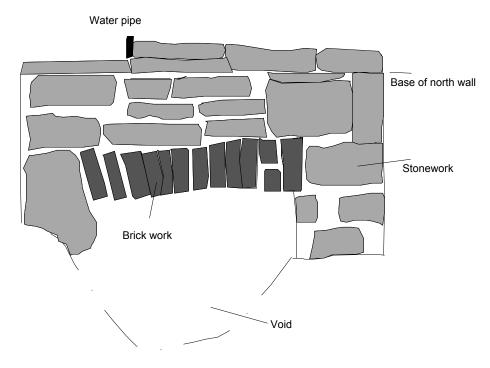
South facing section of toilet block foundations, showing vaulted section of earth closet.
